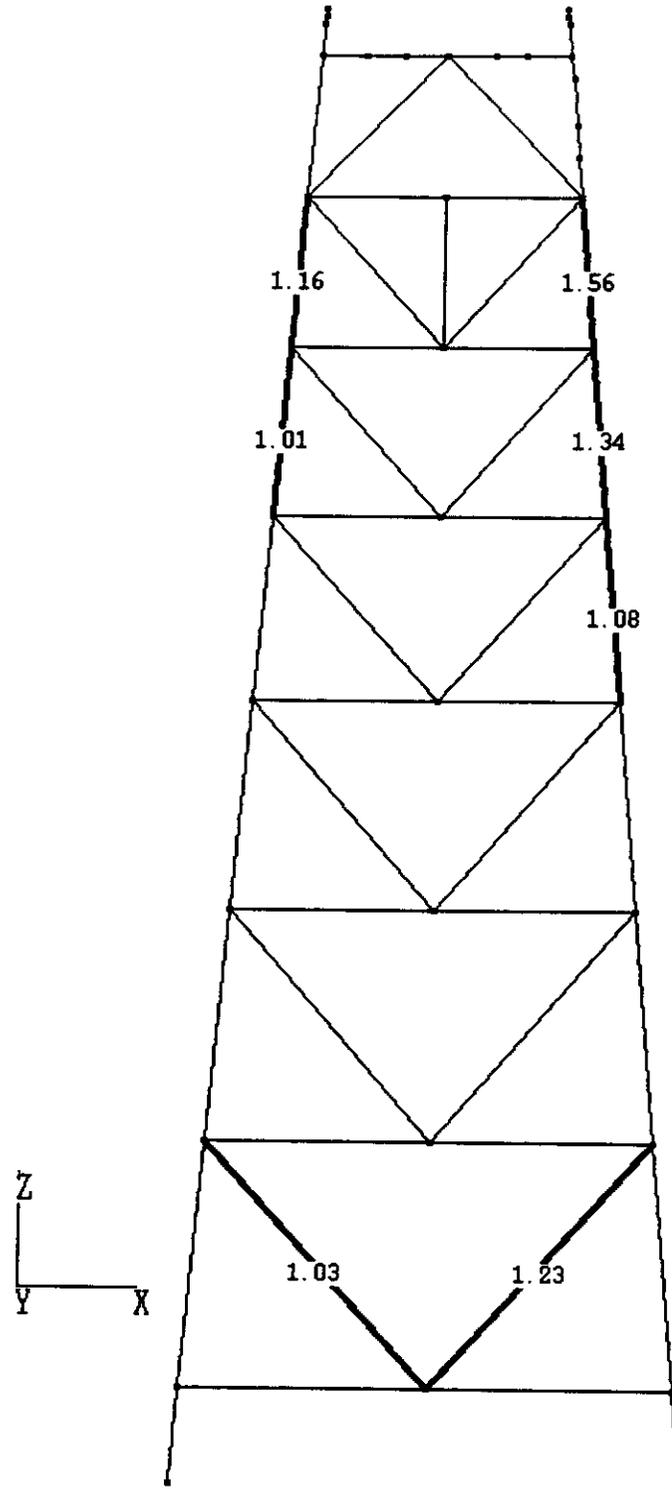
Benchmark Platform - Column Row 2 - Jacket
